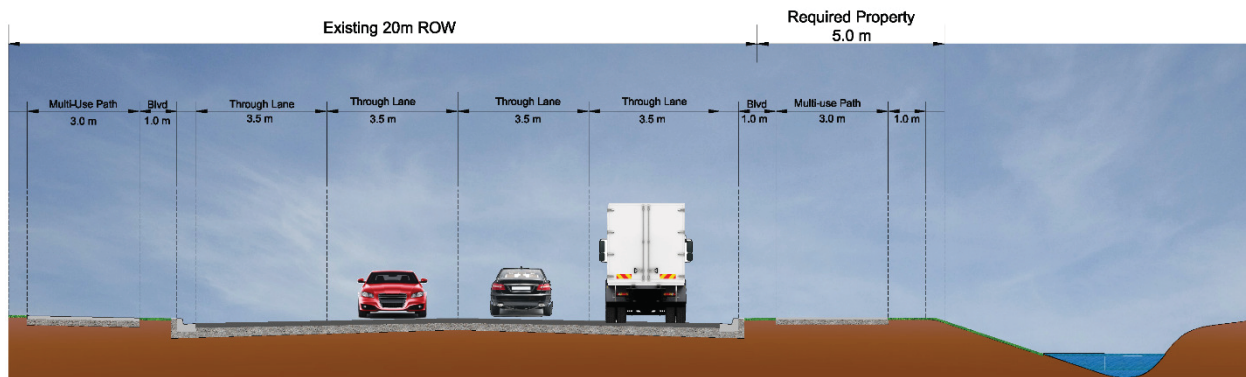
Typical Roadway Cross-Section for York Road Alternative 1.
